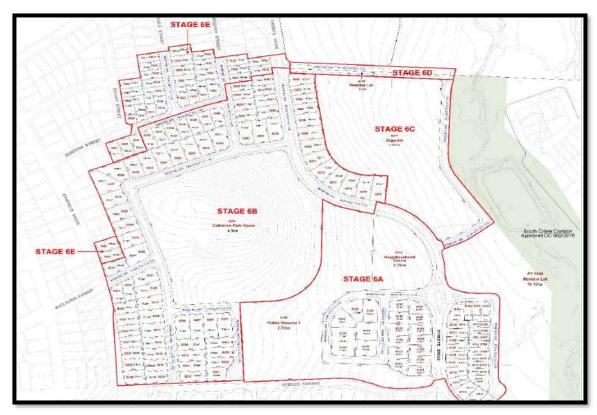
Approved Stage 6 subdivision layout under DA/2017/491/1.
